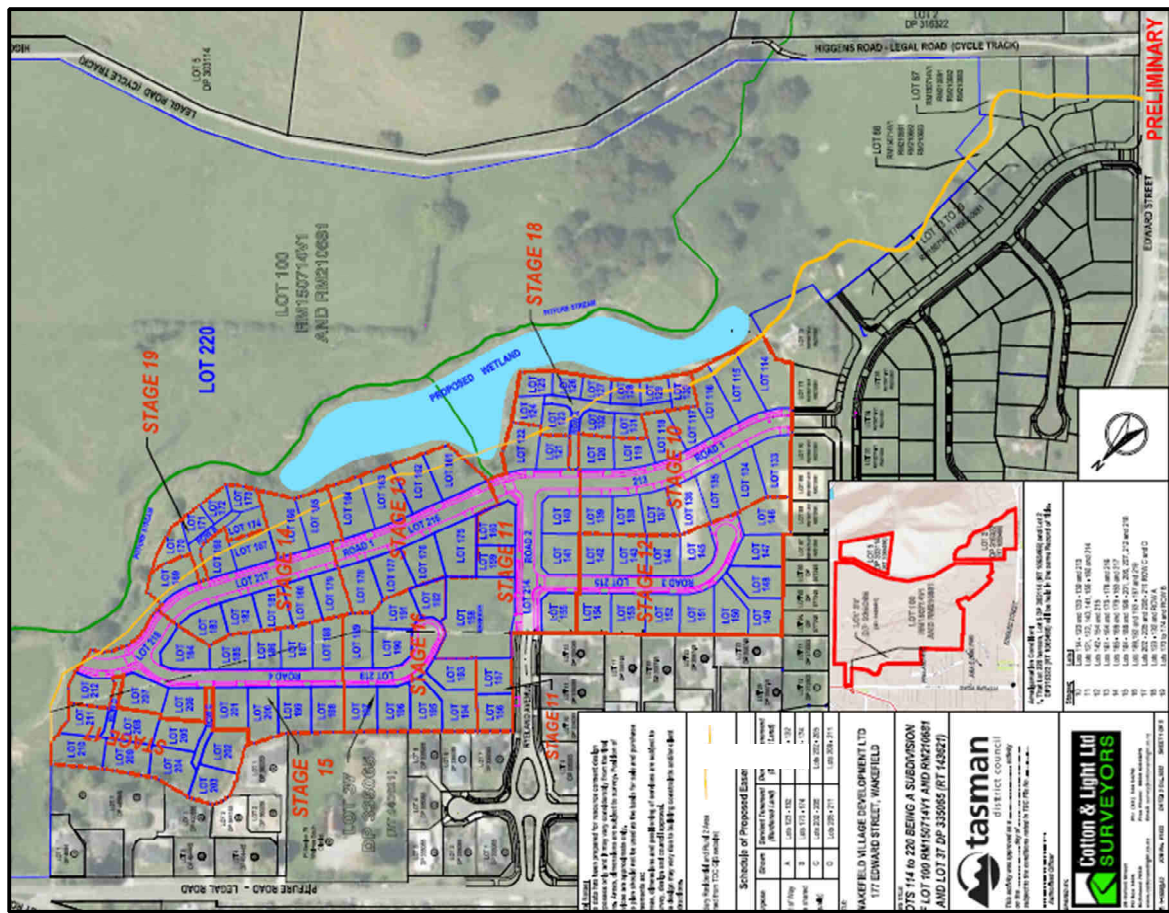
Proposed Subdivision (Source: Cotton and Light)
